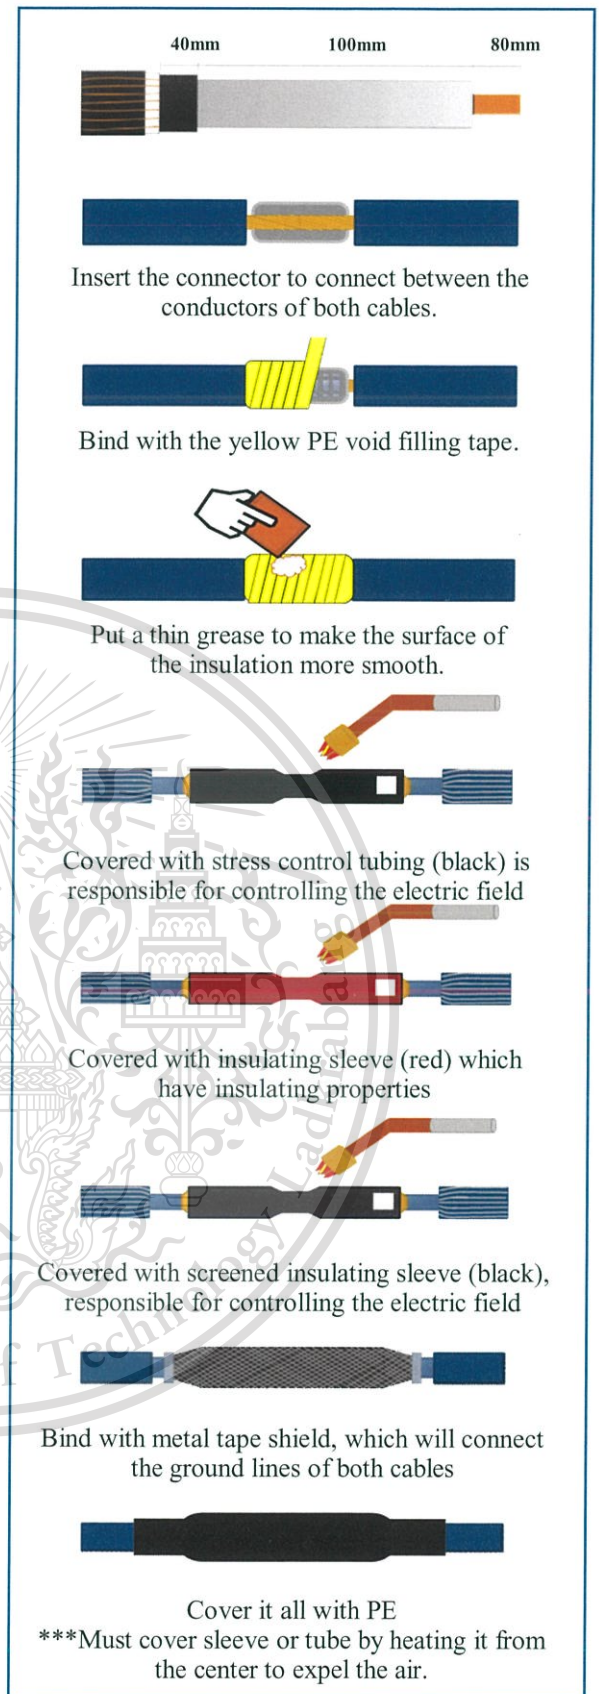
Process for connecting two underground cables with heat-shrinkable joint [6]
